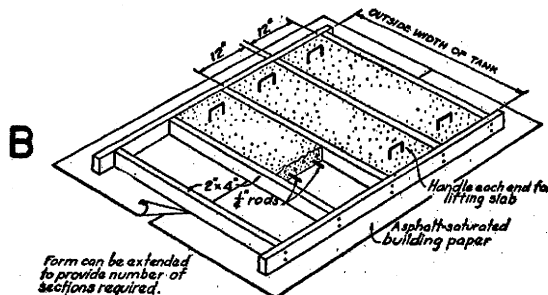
Formwork for single-compartment septic tank and cover sections.
